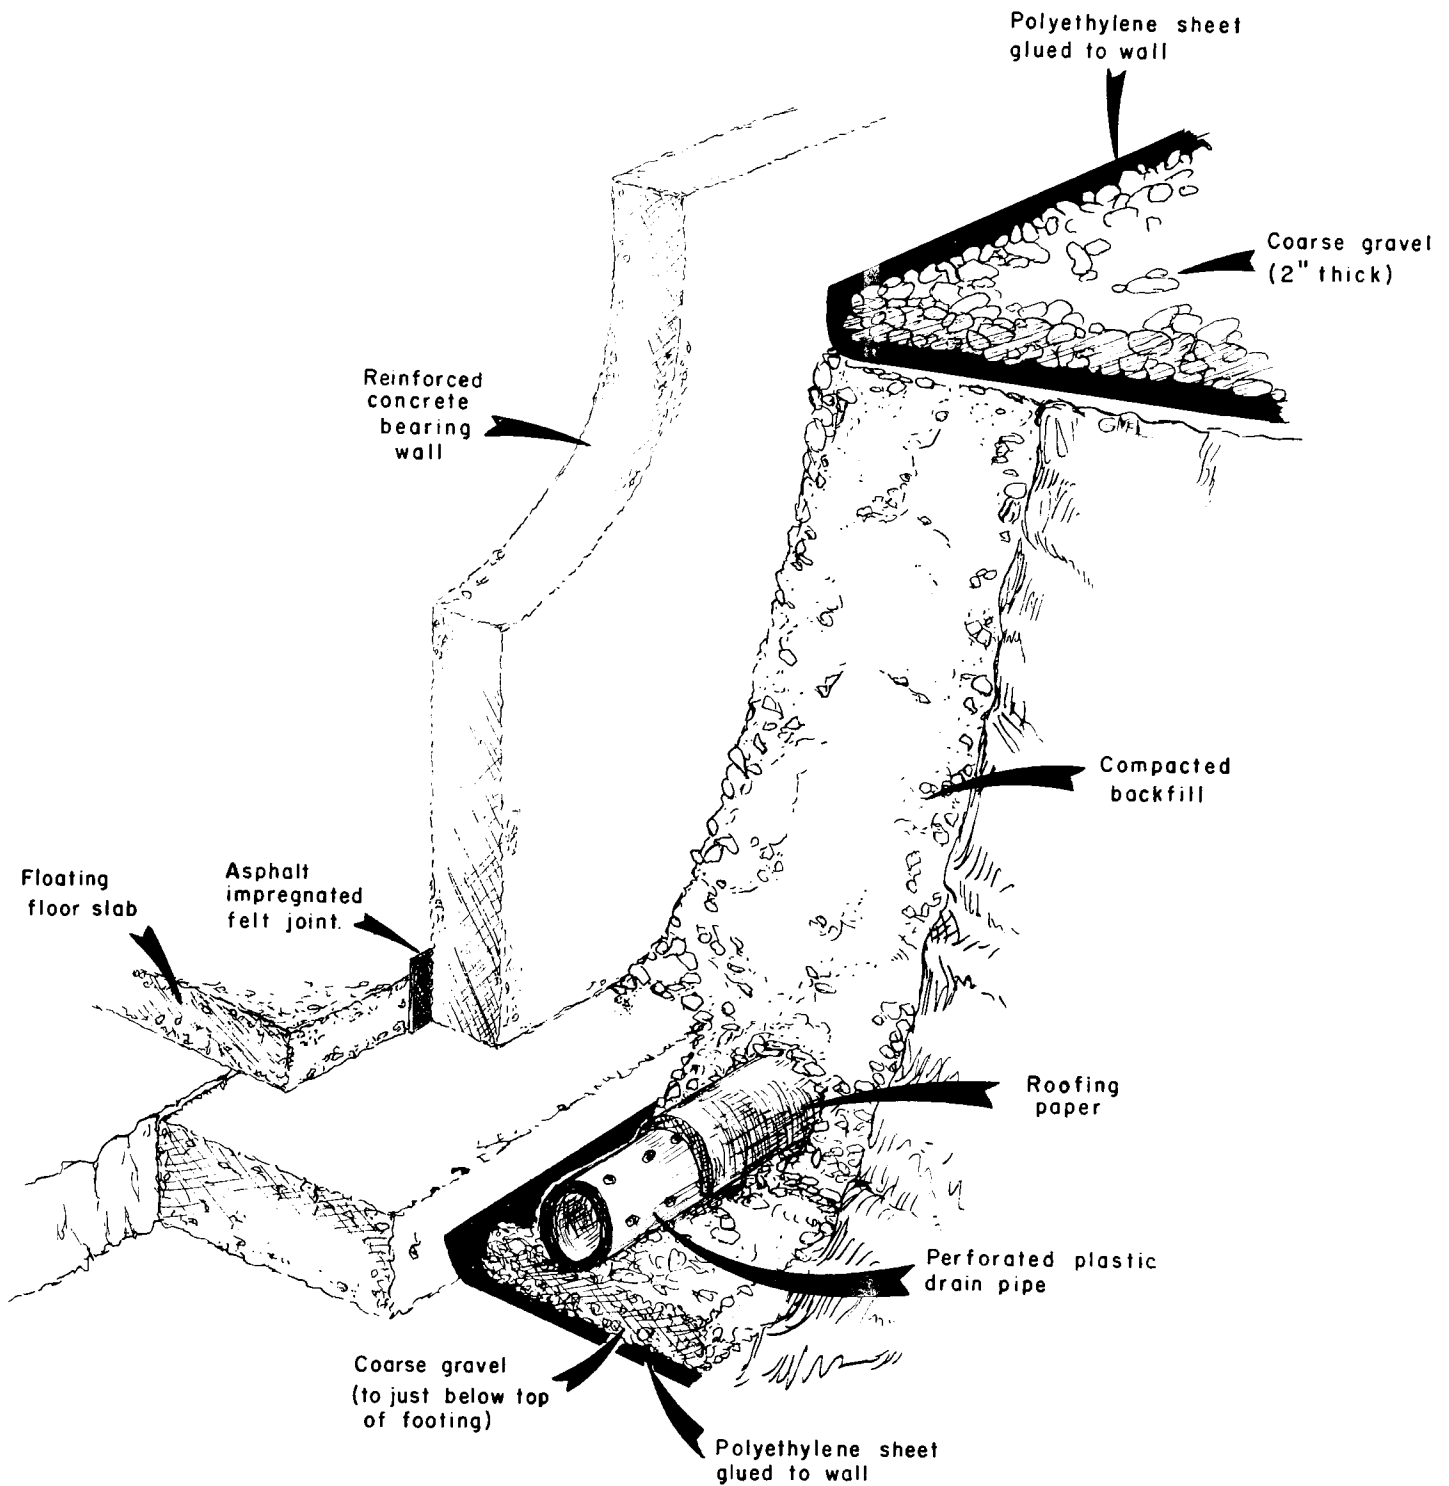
Details of a typical floating floor slab, peripheral drain, and surface moisture barrier, showing specific components but not intended as a model for a specific foundation design (modified from Federal Housing Administration, 1966, p. 91).
